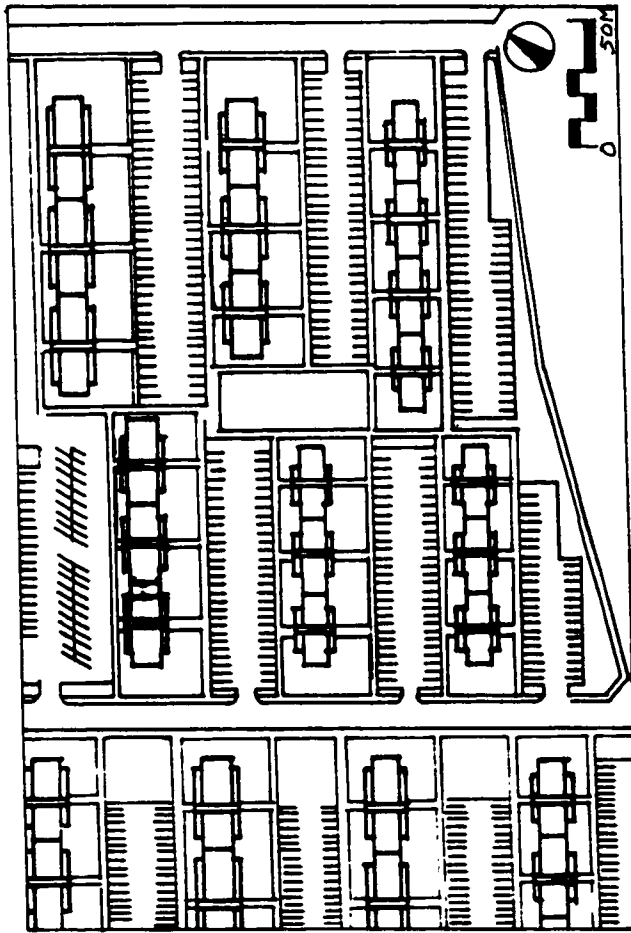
Site layout plan of Apkujung Hyundai apartment complex
